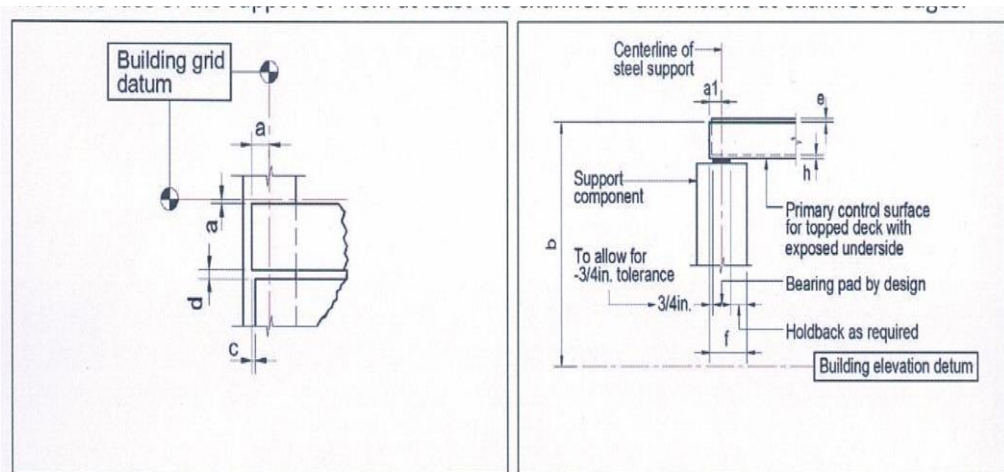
Floor and Roof Component Erection Tolerances
